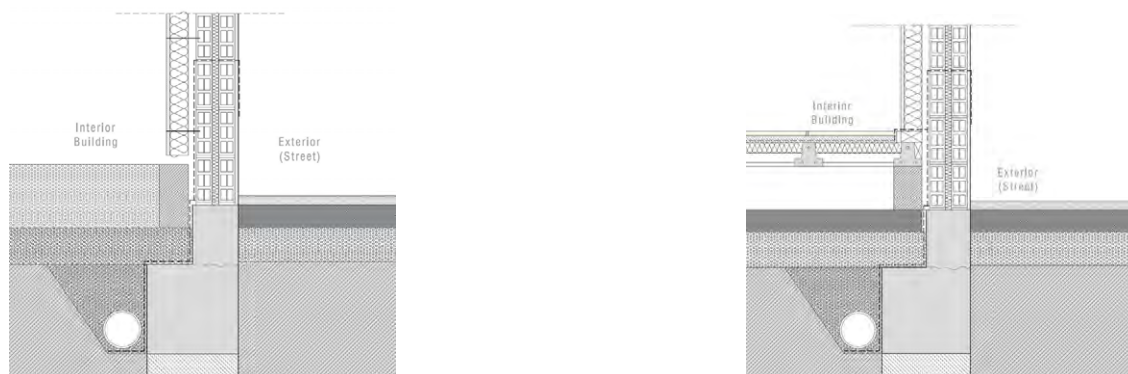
Two steps and a high suspended floor (right) and one step and gravel drainage floor (left) sections.
